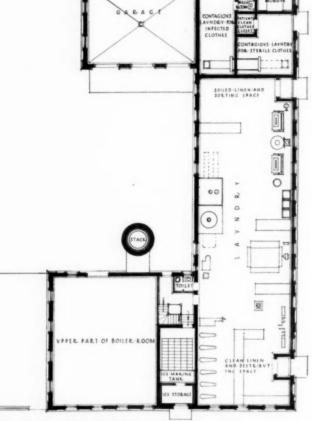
Samaritan Hospital-Power house, First floor plan,
